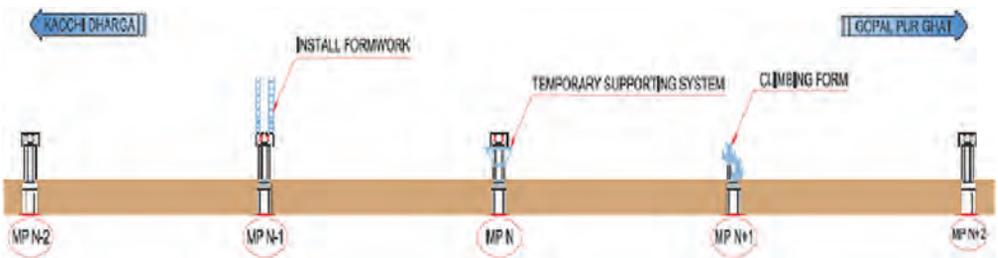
1. Fabrication of reinforcing bar and casting concrete for lower pylon. 2. Installation of the temporary support system for pier table. 3. Construction of pier table and pylon.
